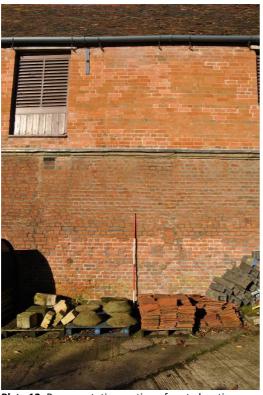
Representative section of east elevation brickwork; primary to GF, secondary facing to 1F.
